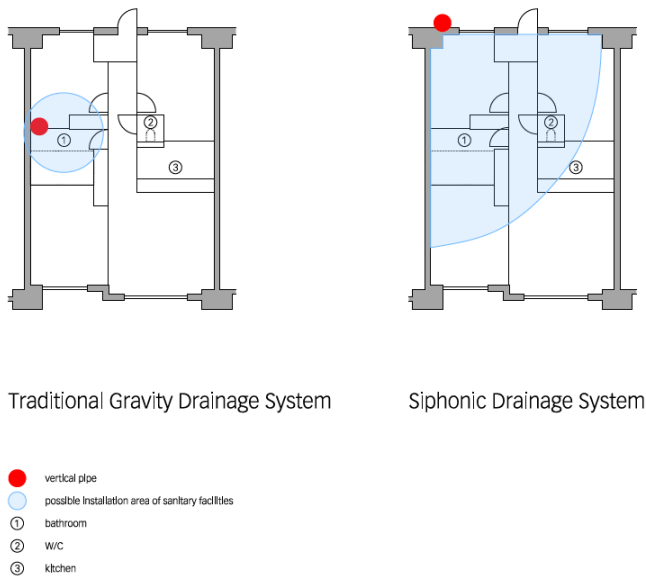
Traditional vs zero slope siphonic system Drainage System plan
